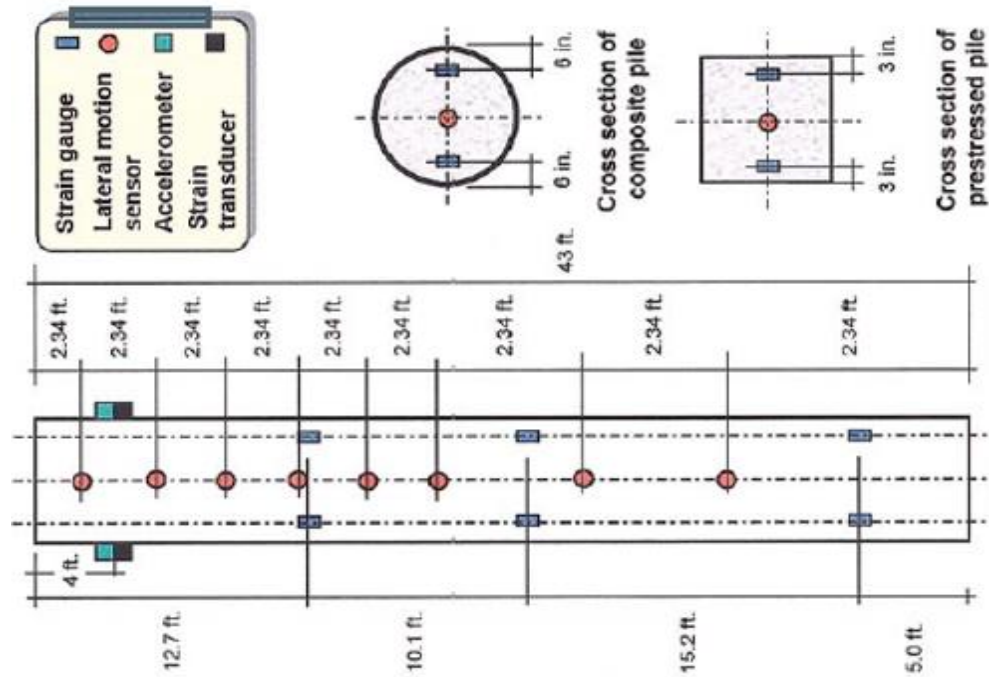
Instrumentation of test piles (Fam et al., 2003)
